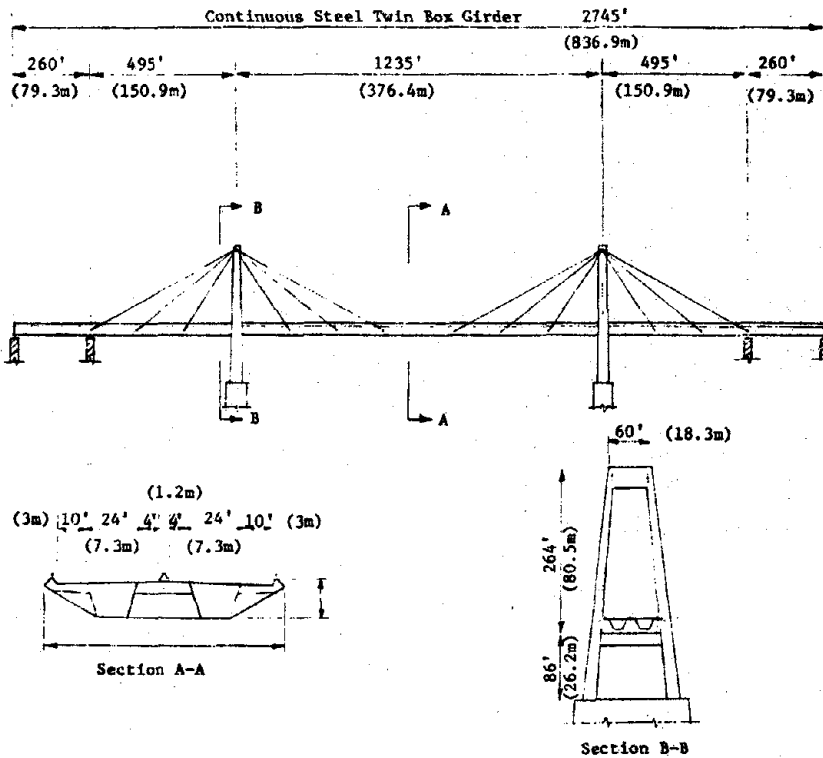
BRIDGE ELEVATION AND CROSS-SECTIONS
